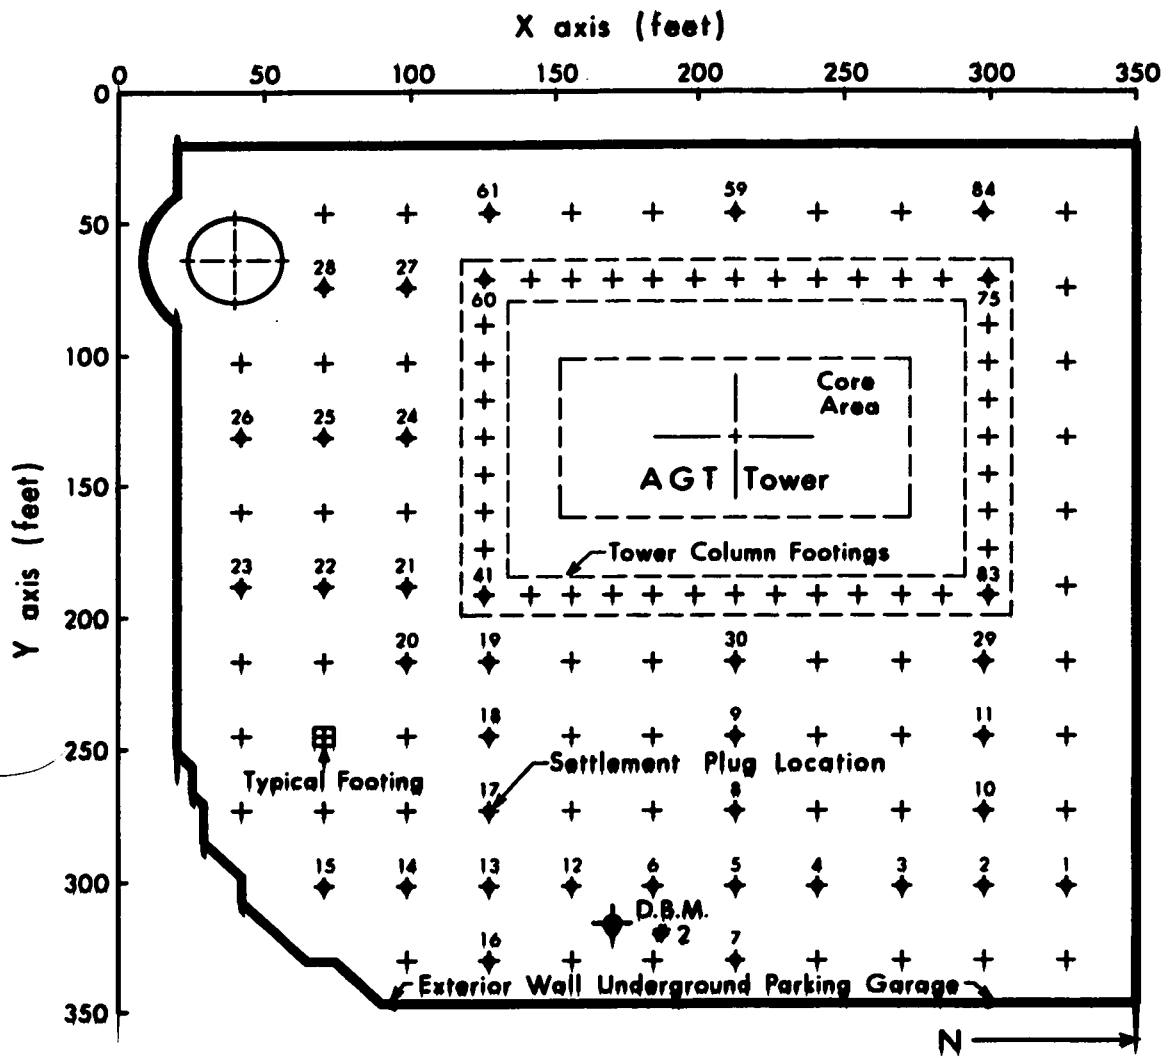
Location of Settlement Plugs in Lower Parking Garage, AGT Tower
